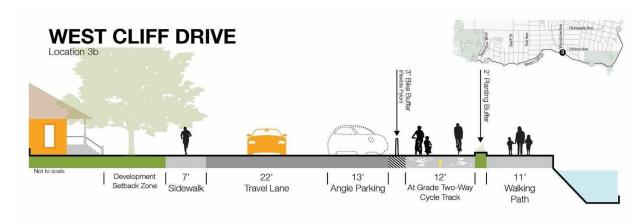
Alternative 2 Concept- Cross Section of parking lot on West Cliff Drive, east of Woodrow Avenue
